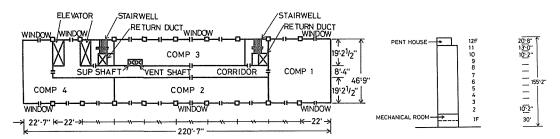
Plan view of floors 2 through 11 of the NBS Administration Building
